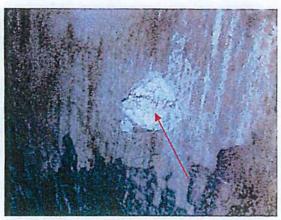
View of boiler body insulation (HA-K) on the boiler.
